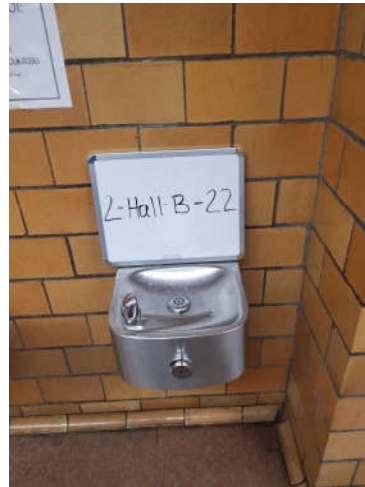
Bubbler, located on the 2nd floor next to room 211.
